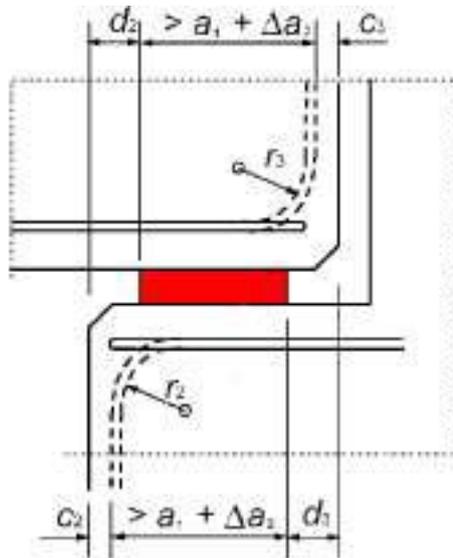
b Example of reinforcement detail on a support
